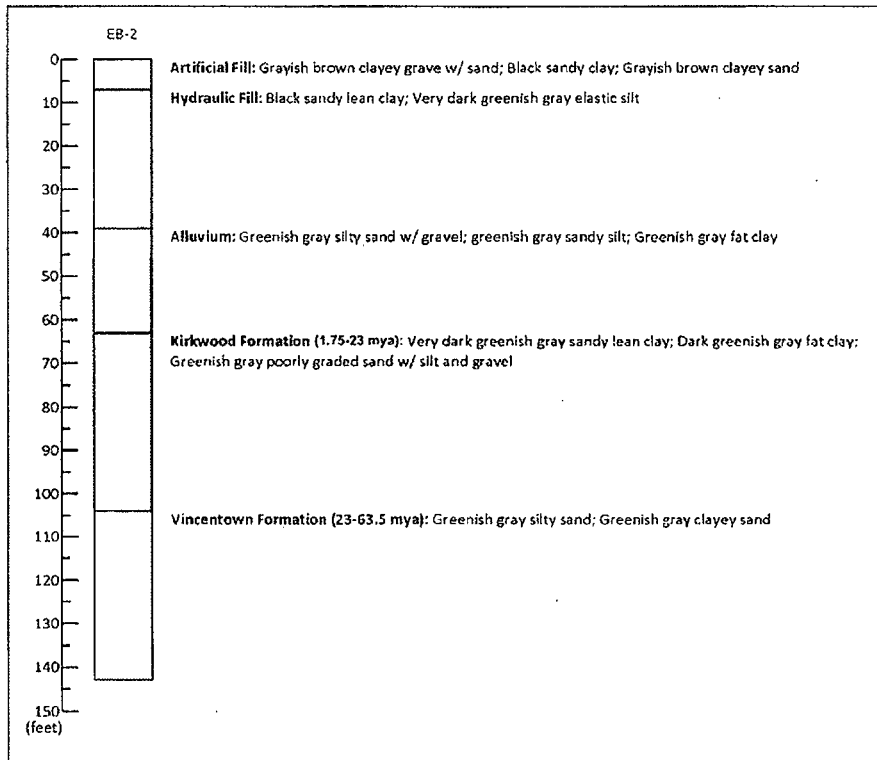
Partial Soil Profile Showing Soil Strata at Boring EB-2 (Surface Elevation 14.1 NAVD88).
